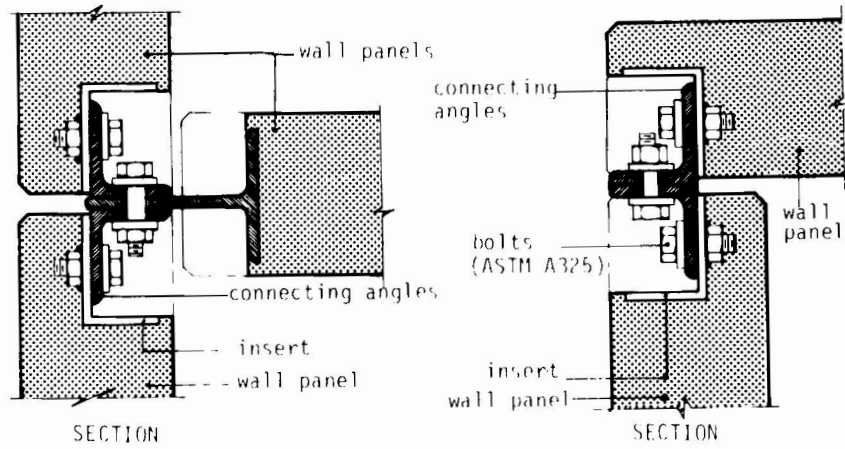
CORNER WALL-TO-WALL JOINTS
